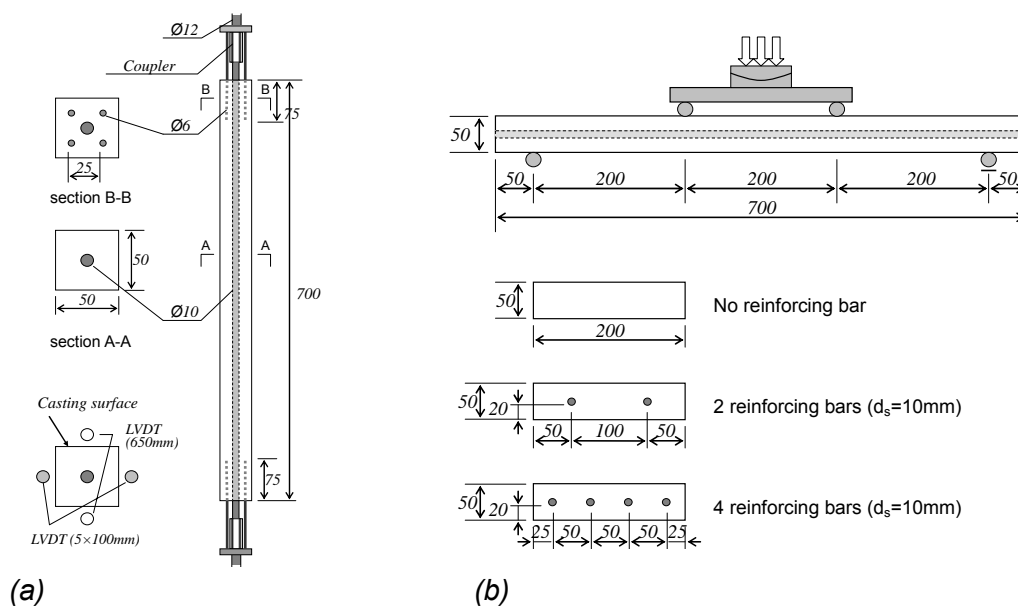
Specimen details of axial tensile test (a) and four-point bending test (b)
